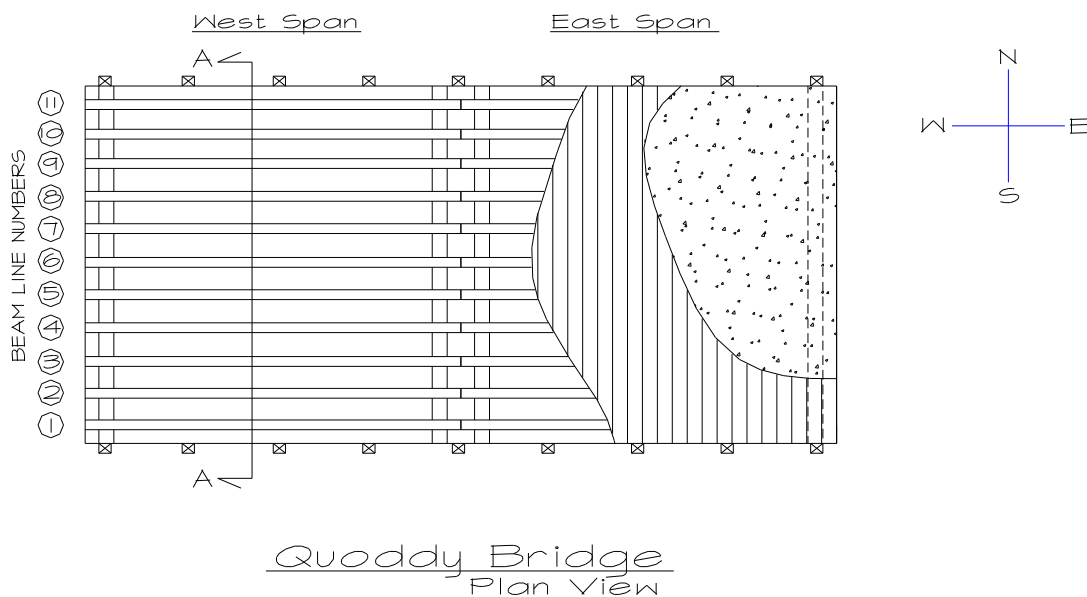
Quoddy Bay Bridge plan view showing spans and girder numbering.
